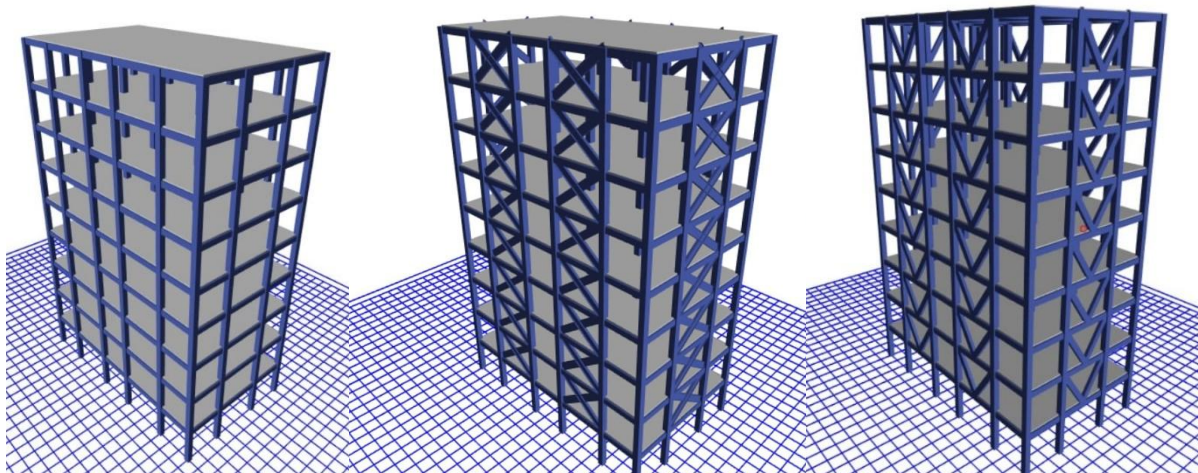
3D RENDERED VIEW OF UNBRACED,X& V G+8 BUILDING
